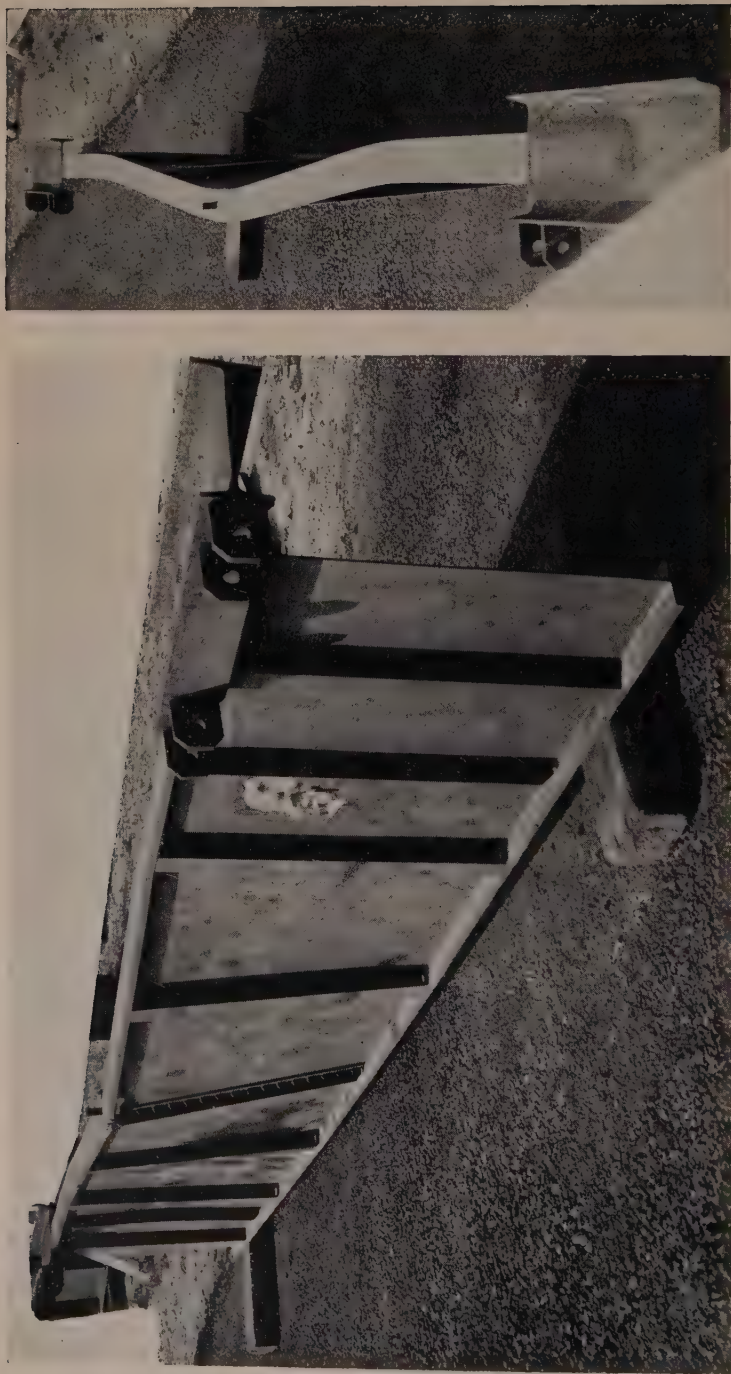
GIRDER No. 2 AFTER FAILURE UNDER 66.7 TONS AT EACH LOAD POINT
